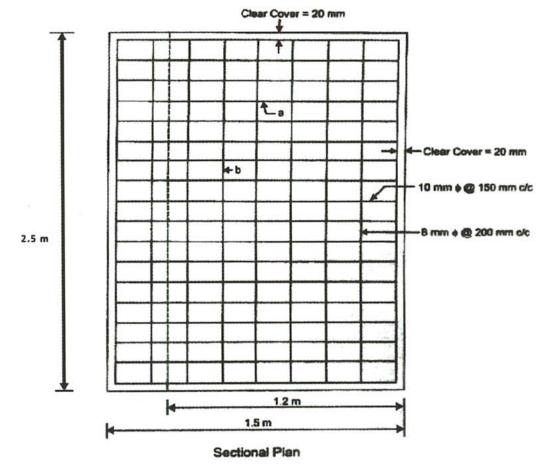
Reinforcement Details of a cantilever slab having an overhang
